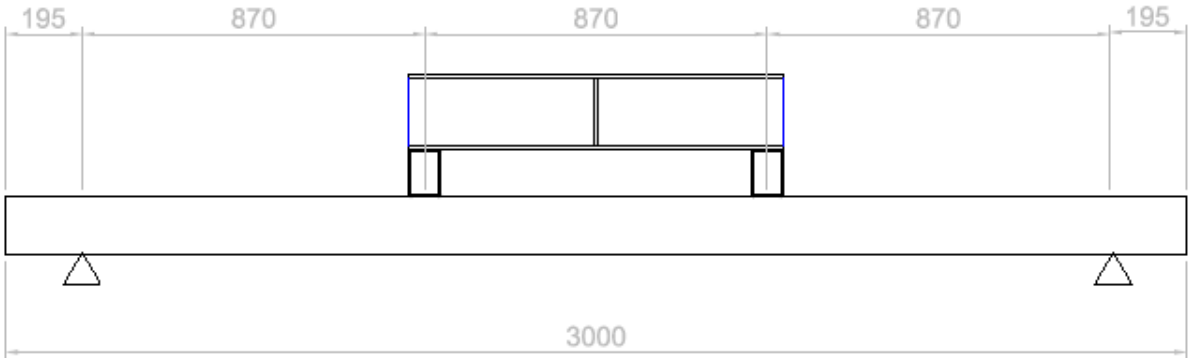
Load rig used to apply the load on the SLTD in the tests.
